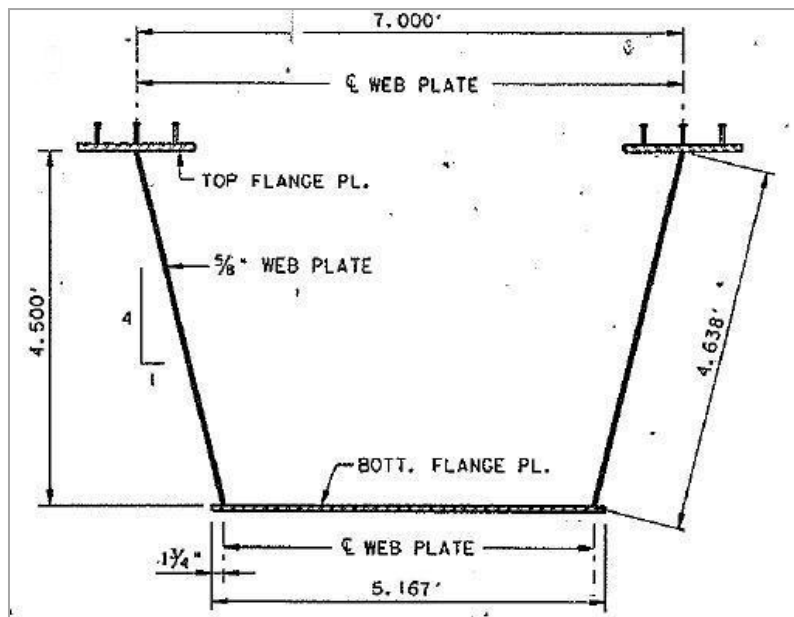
Typical cross-section of the Woodway Bridge Span 17 & 18 steel girder
